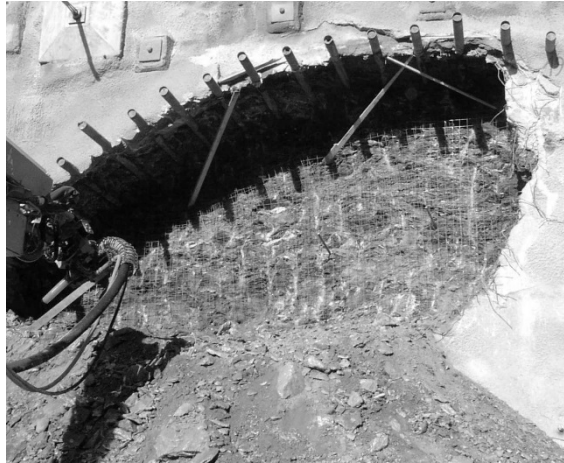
West portal of the Birgl tunnel (AUSTRIA) supported by a pipe roof
